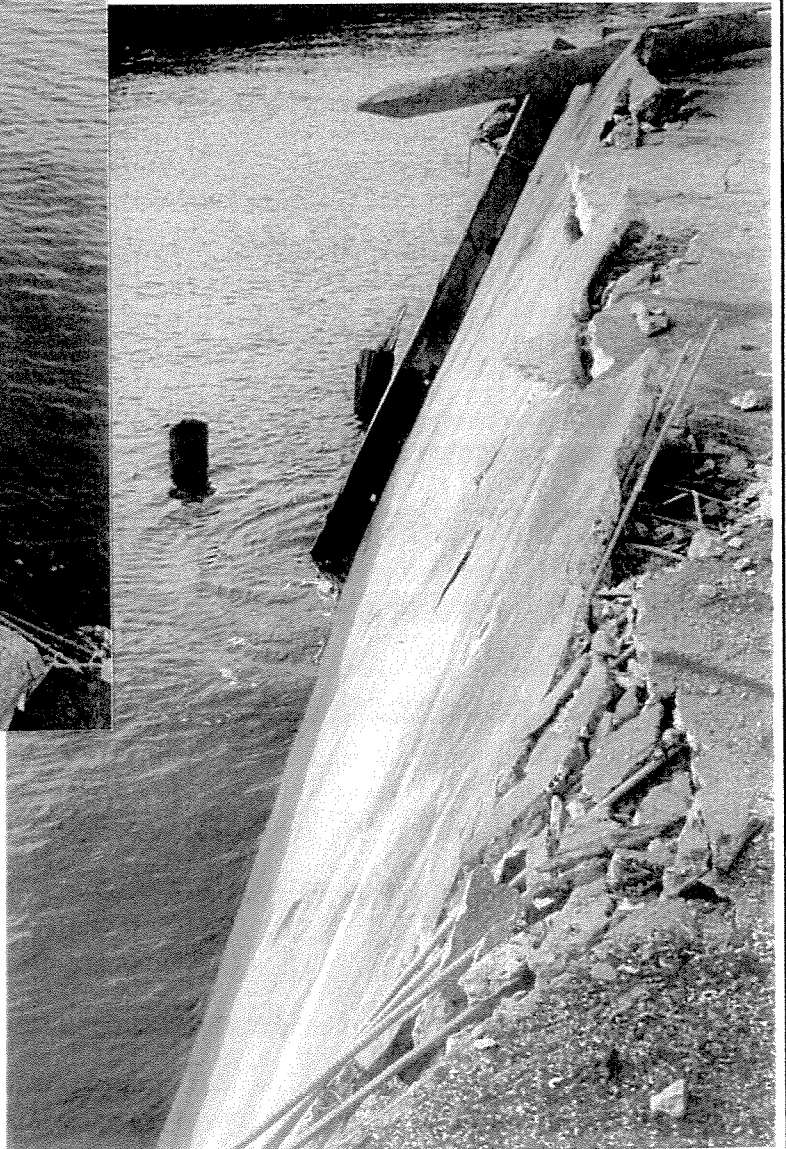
Top side view of collapsed SE corner of the pier looking SW.
